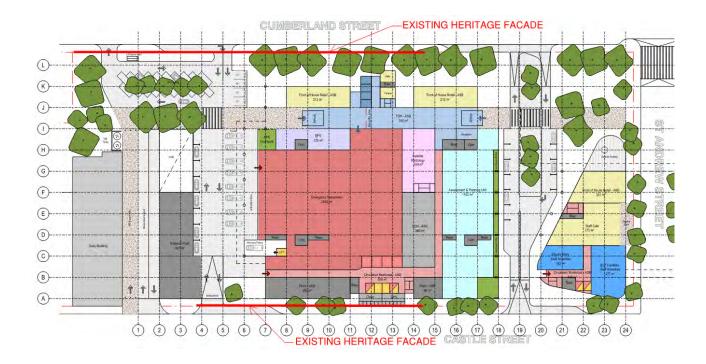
Level 00 - Block and Stack Option 5.3 with façade locations
